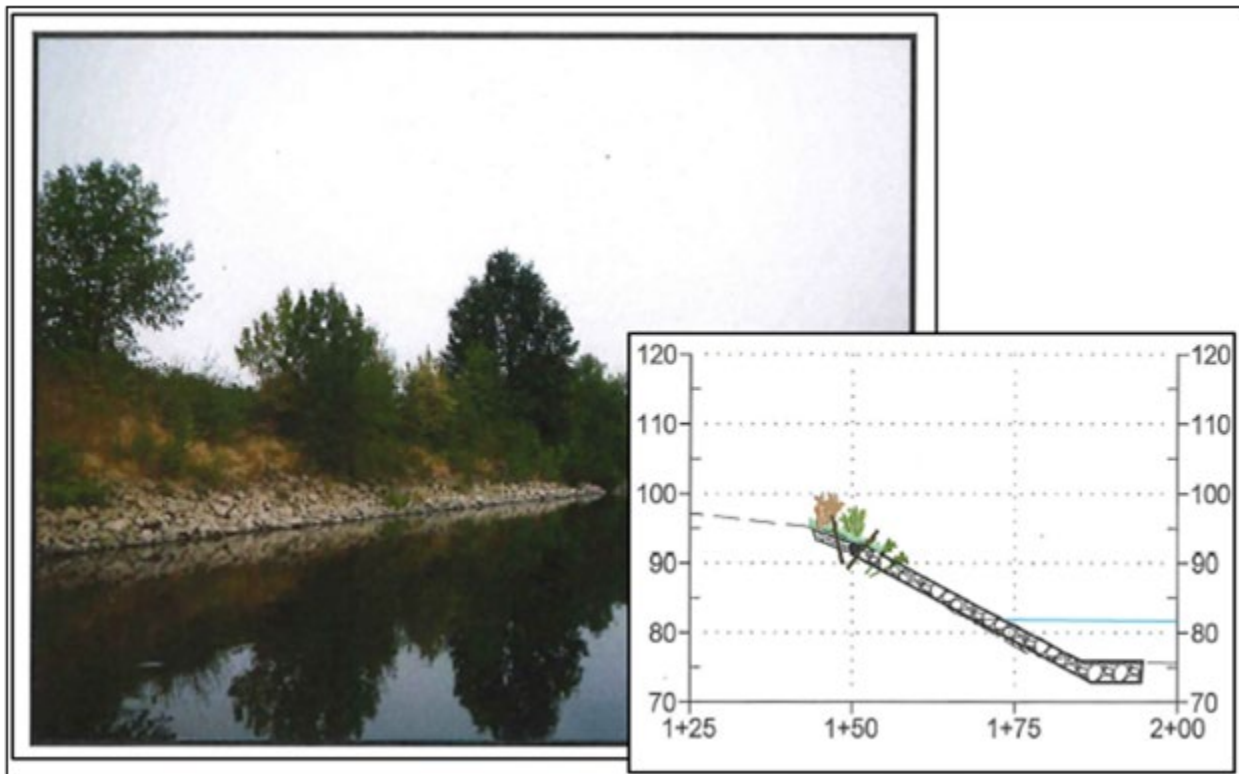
Example Willamette River Revetment North of Salem, Oregon with Typical Cross Section.
